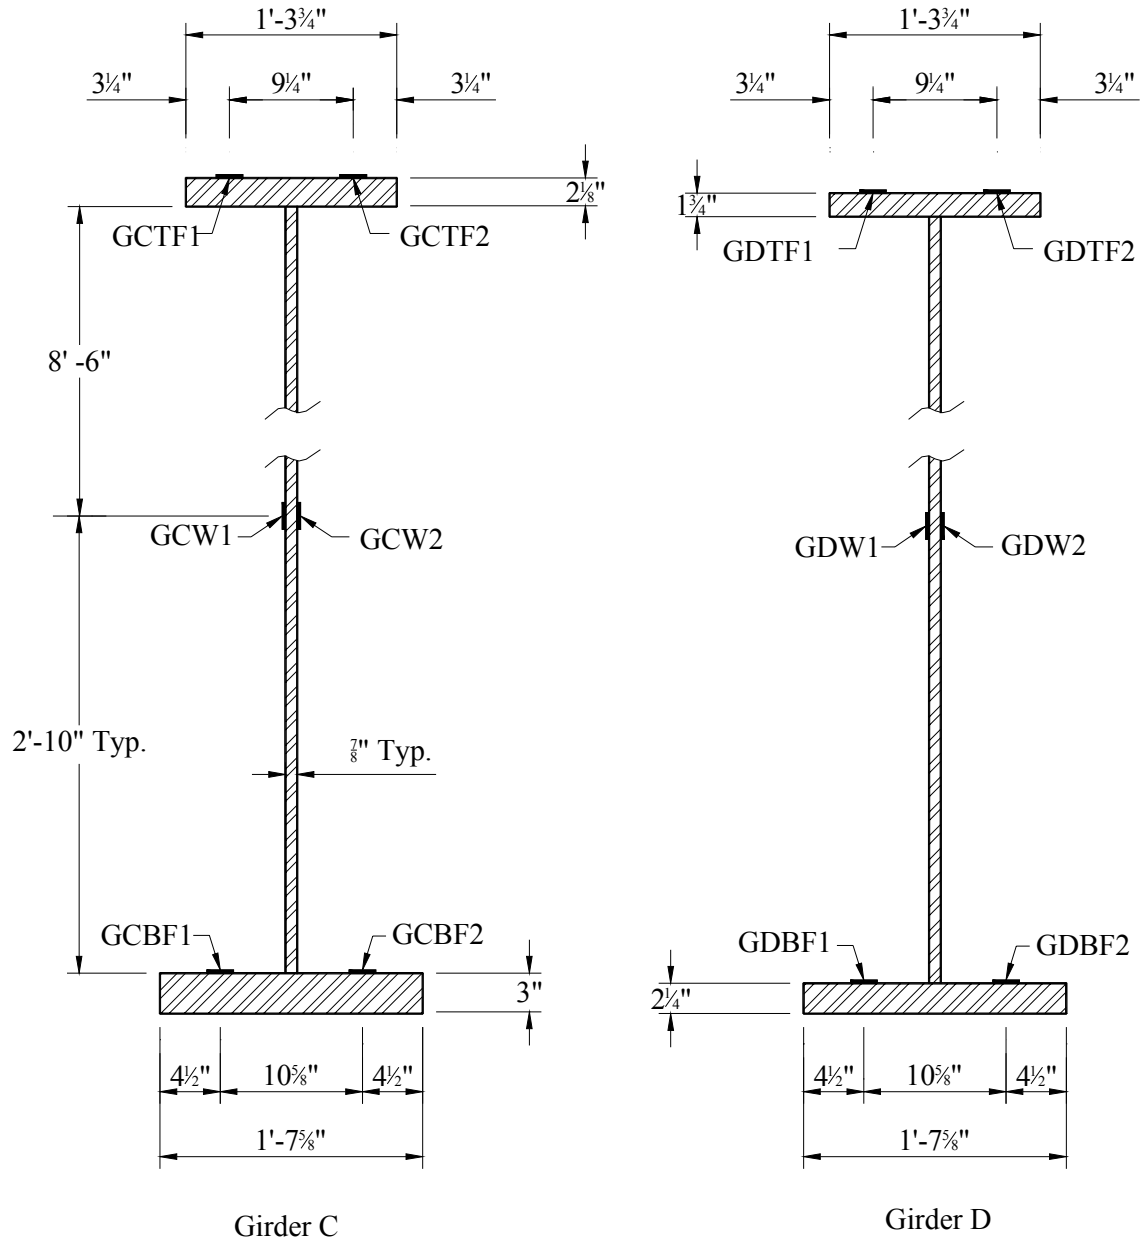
Instrumentation of Girders C and D – Launch WB1.
